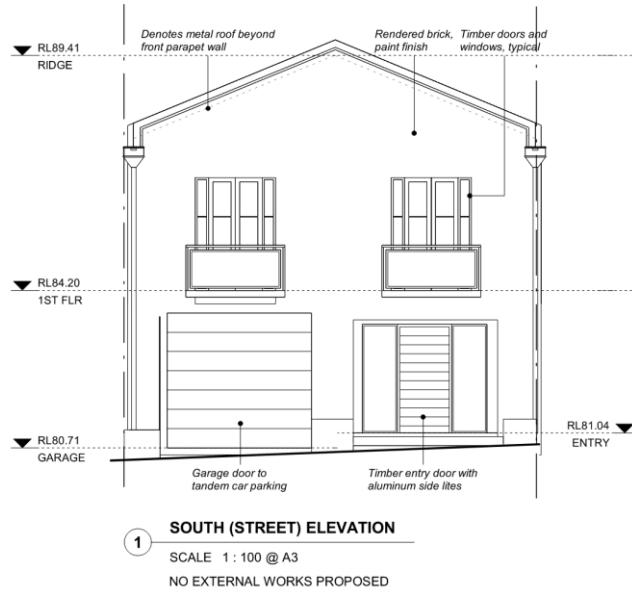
Proposed South (Street) Elevation (Source: HallGroup & Co)
